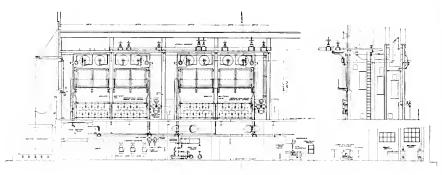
Elevation of Boiler Room Wall Bethlehem Chile Iron Mines Company
